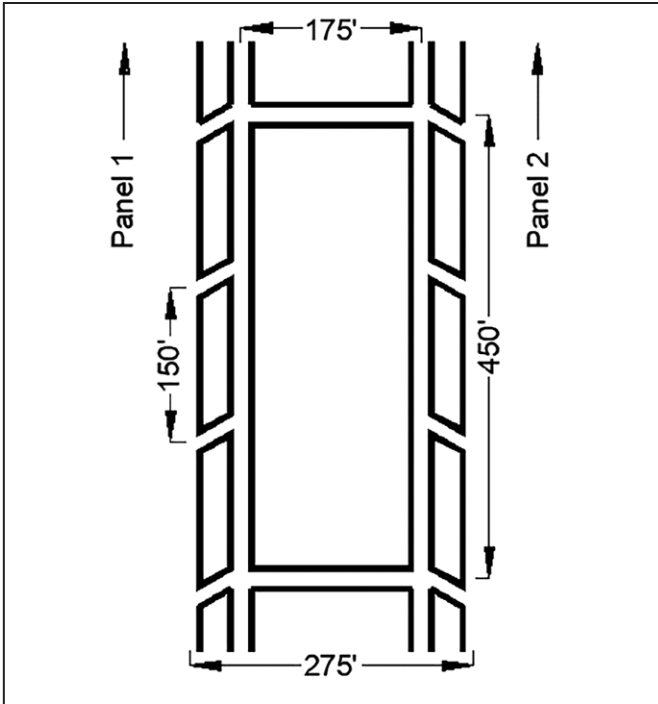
Plan view of mine map depicting the previously used four-entry yield-abutment-pillar layout
